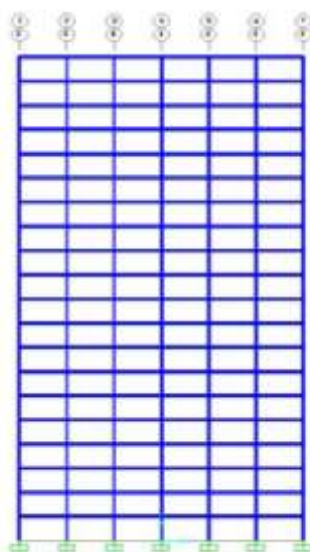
Elevation of G+20 multistoried Steel Building in SAP2000
